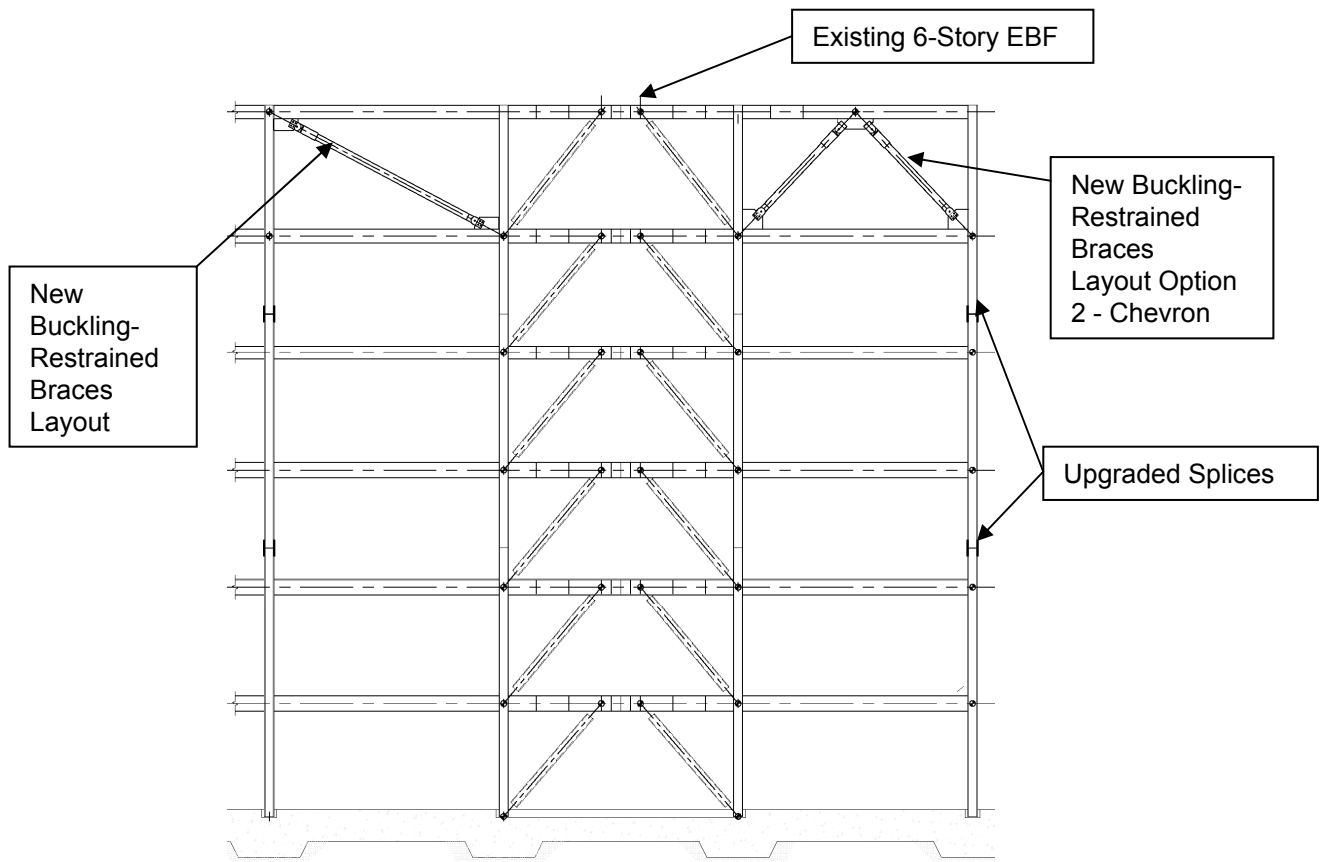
Typical elevation of outrigger braced frames at 6th floor
